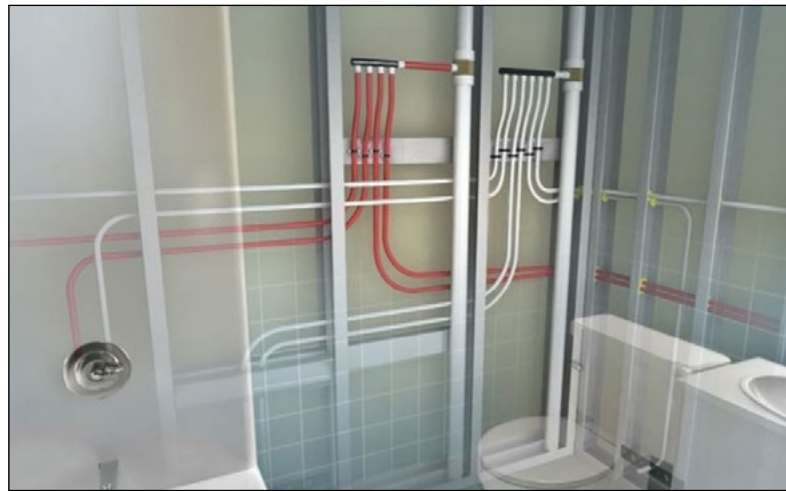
Properly Installed PEX Plumbing System within a Bathroom
